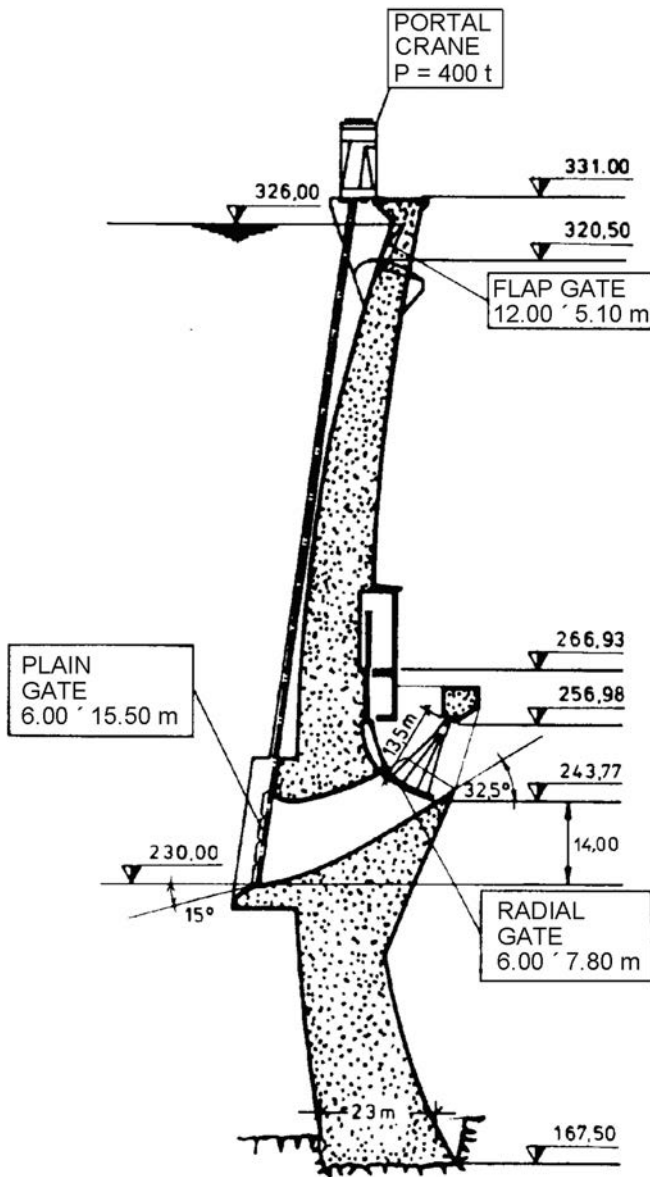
Cross-section through one of the high-head spillway openings of Cahora Bassa Dam.
